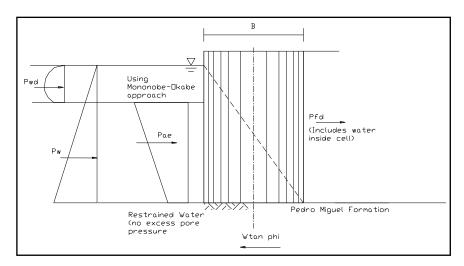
Horizontal pressure components acting on the cofferdam during the construction stage (seismic loading)
